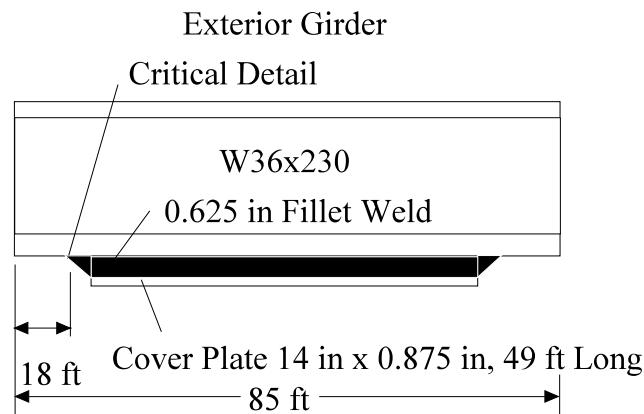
Welded Cover Plate Girder, Detail No. 3
